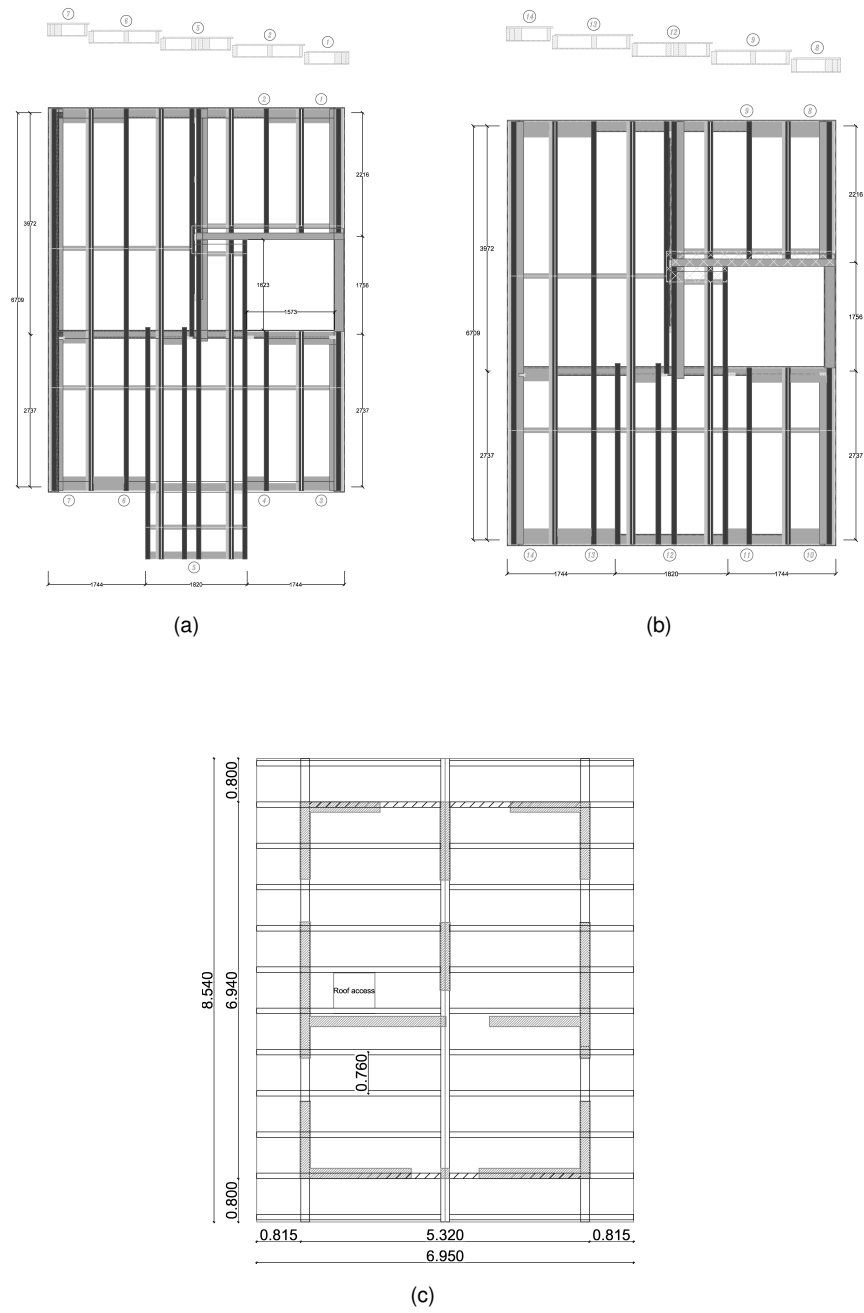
Structural layout of the floors - a) first floor - b) second floor - roof.
